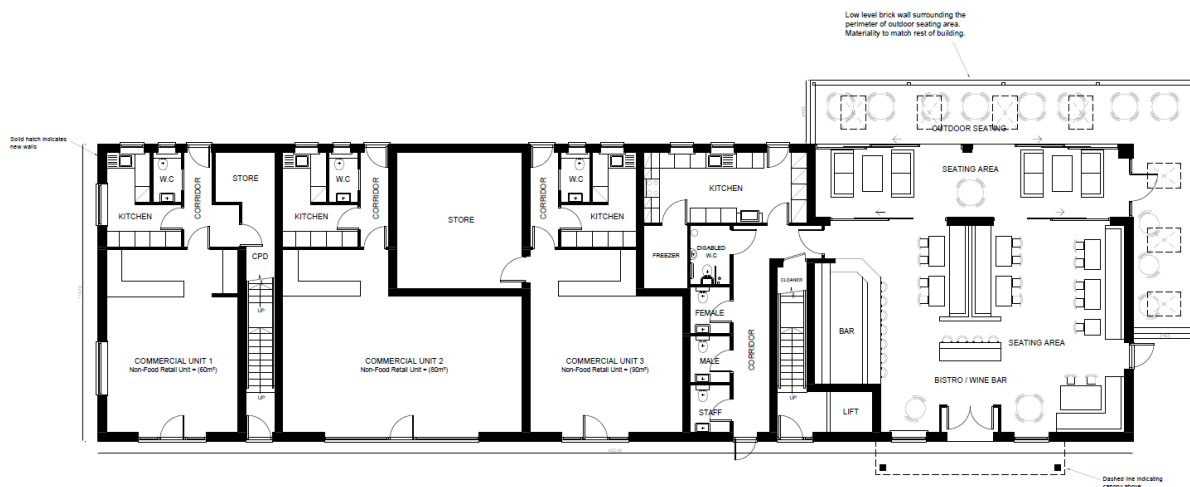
Excerpt from 01823-SK-01 showing the Ground Floor Plan
